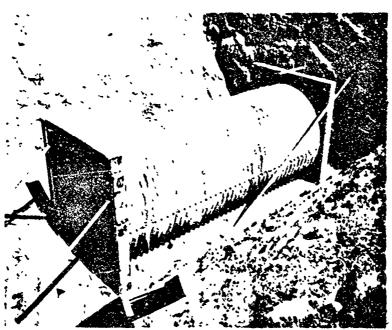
Exterior view of circular steel conduit prior to installation of access passage.
